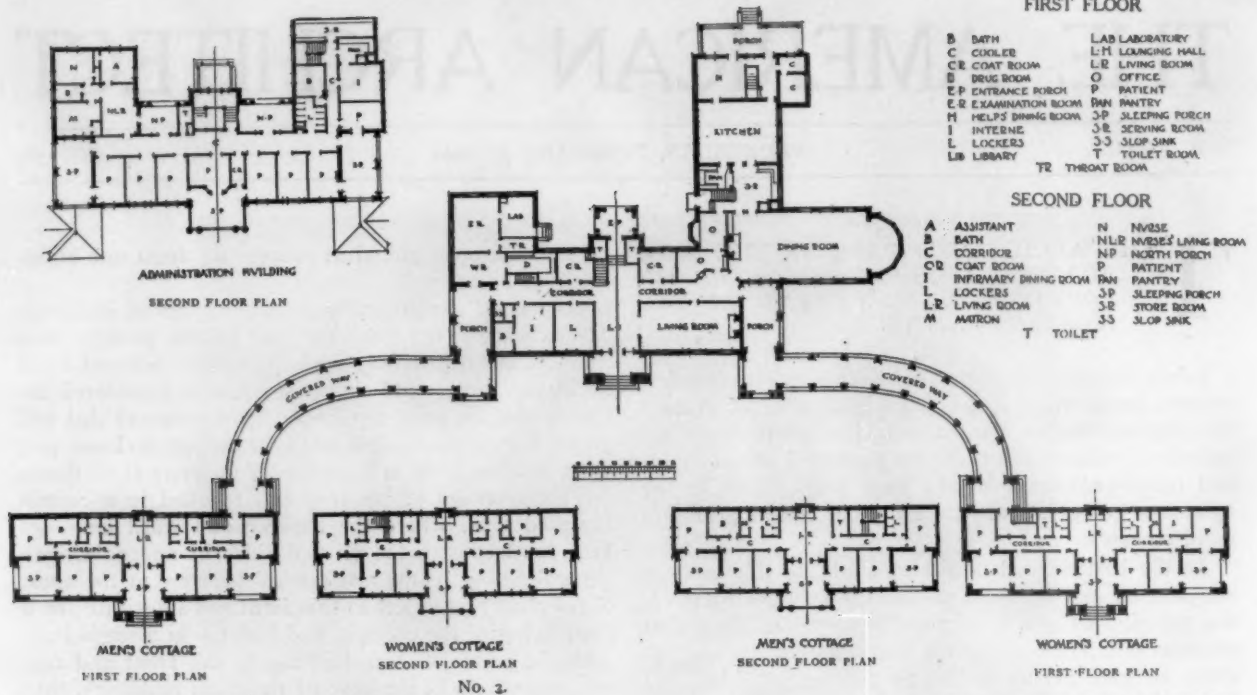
FLOOR PLANS, VERMONT SANATORIUM
